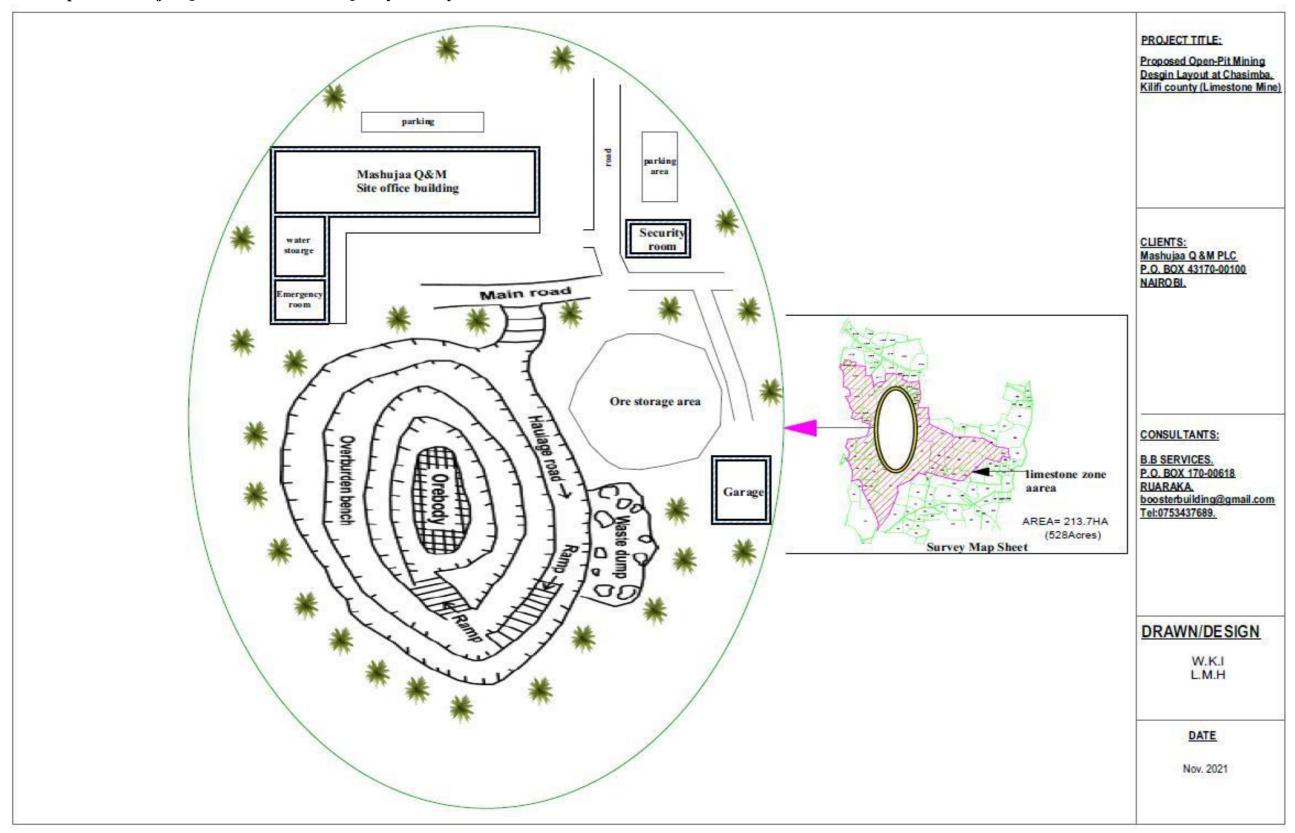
Proposed Mashujaa Q&M Limestone Mine/Quarry Site layout.
